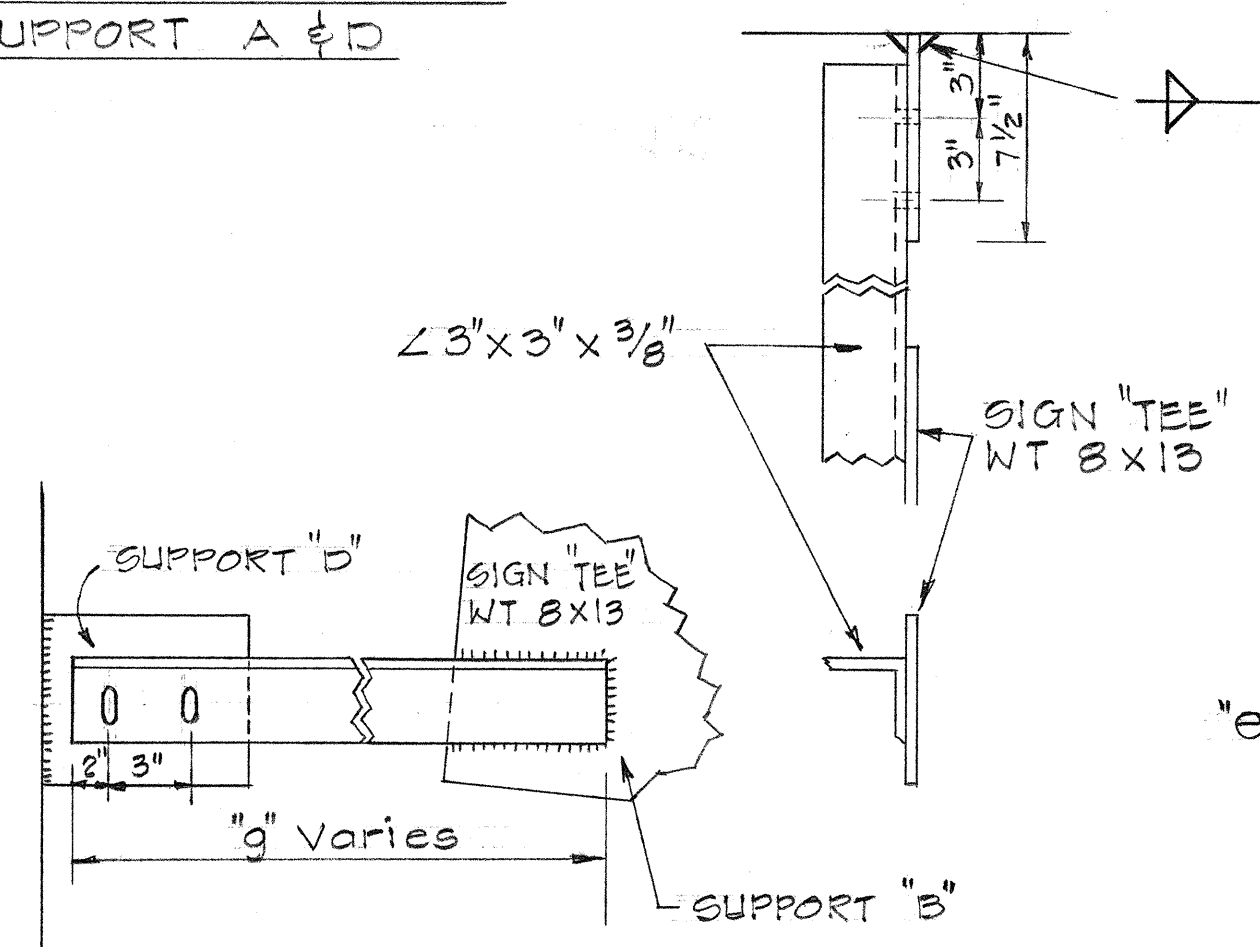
DETAIL FOR OVERHEAD DESTINATION SIGN D-8
